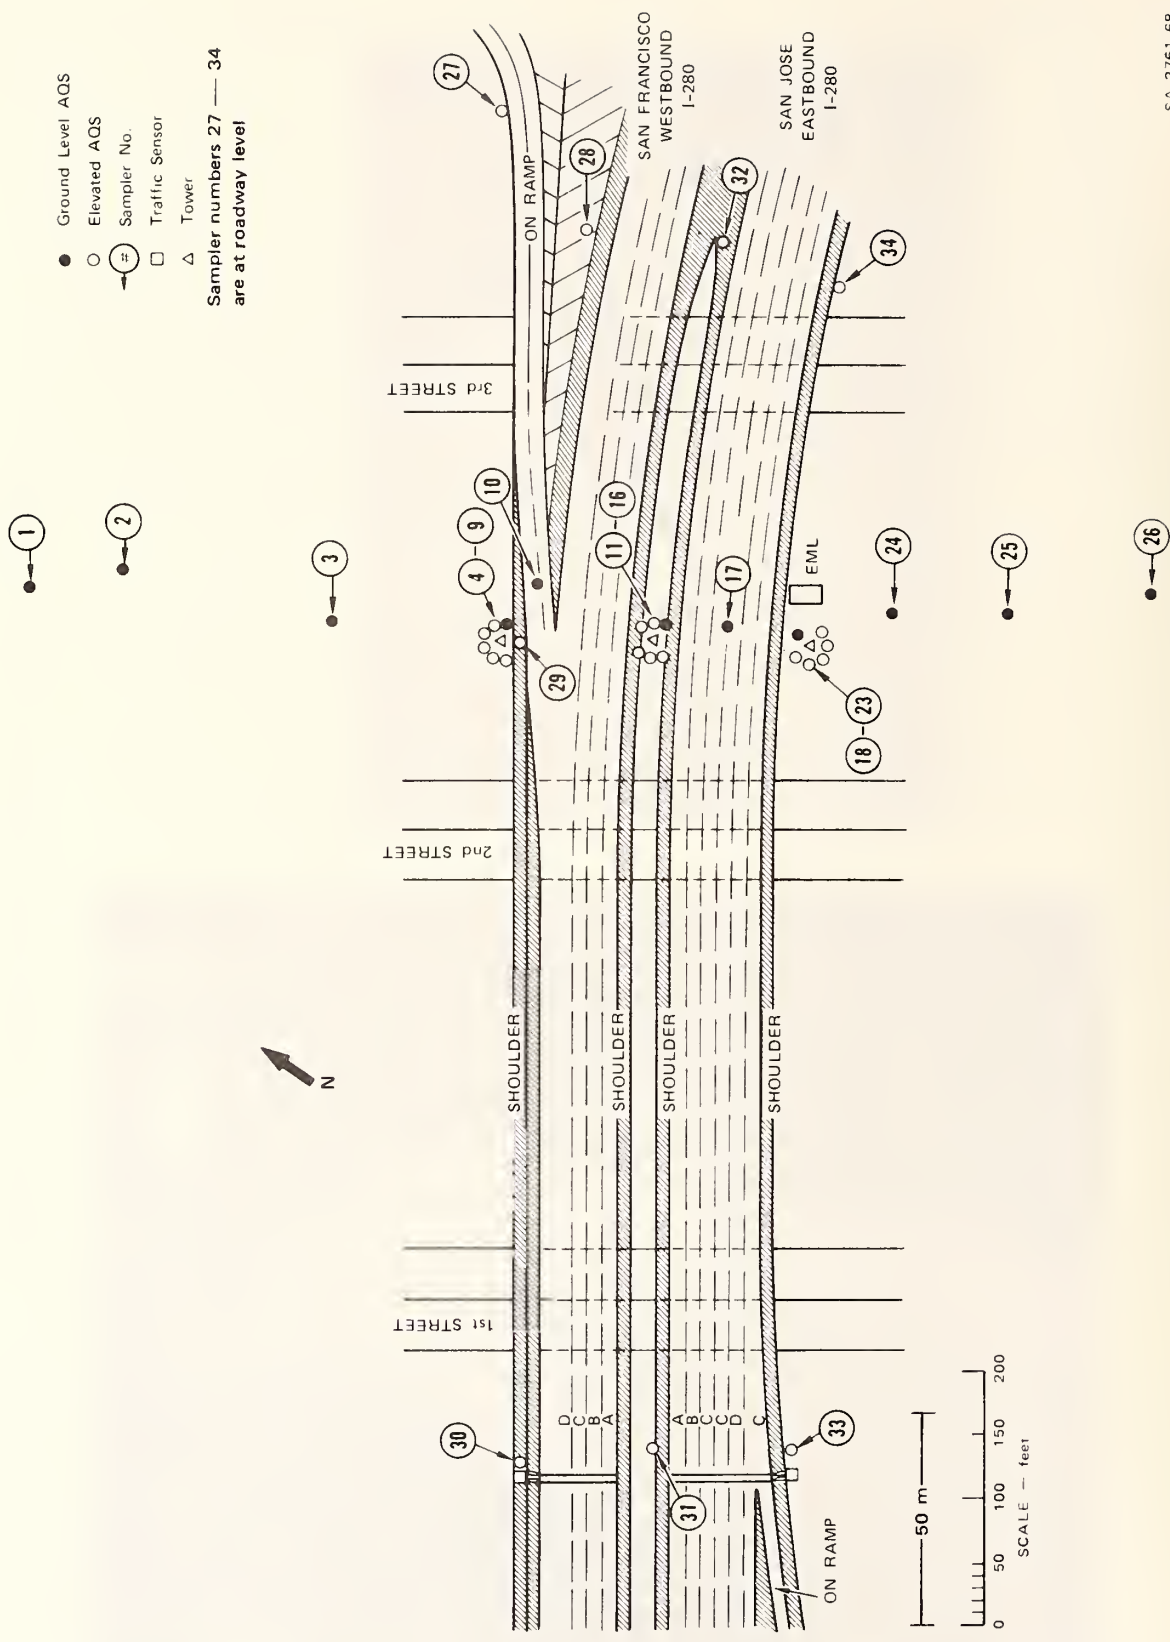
PLAN VIEW OF INSTRUMENTATION AT VIADUCT-SECTION ROADWAY SITE
